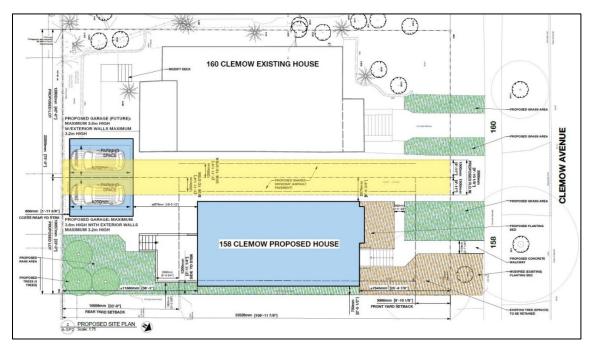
Proposed easement / Right of Way (yellow) shown on the site plan.
